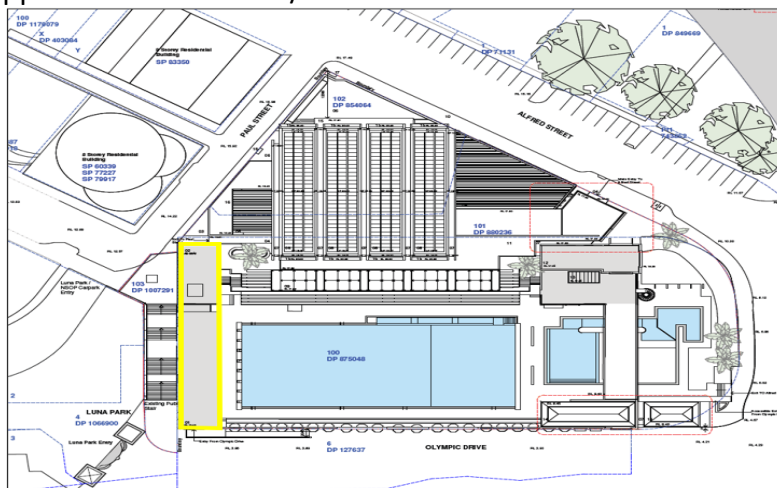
Extract of DA347/2019 Site Plan showing location of existing restaurant building the subject of this DA outlined yellow (Source: Brewster Hjorth Architects, 2020)
